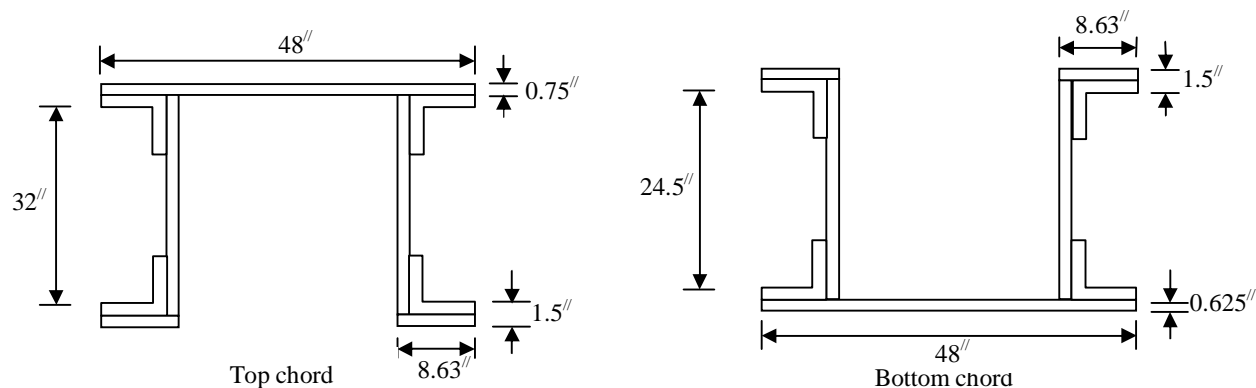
Cross sectional details of top chord and bottom chord of Hardinge bridge
